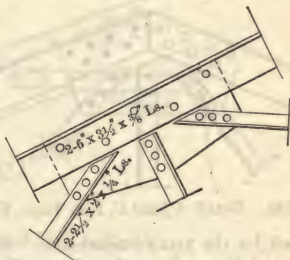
A. Detail of Joint D, Fink Truss, Fig. 7
